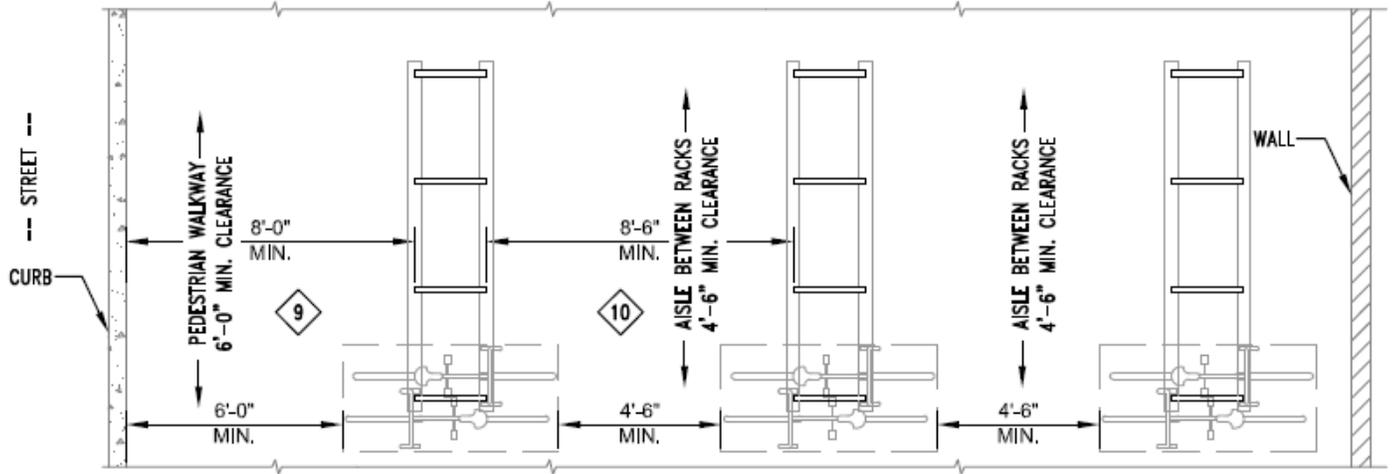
Bicycle Parking Layout Examples and Requirements
